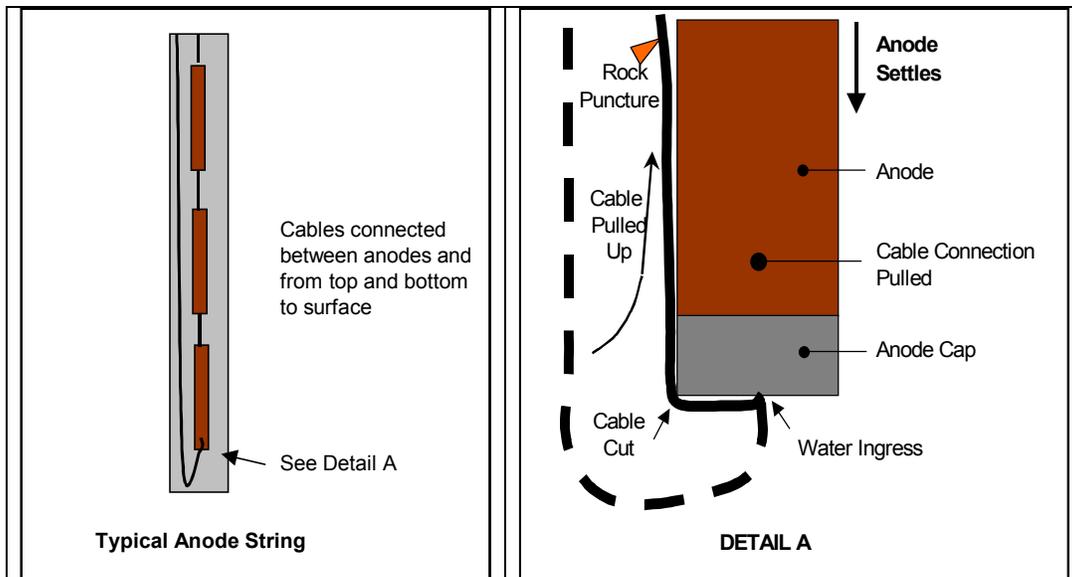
Typical Anode String in Early Installations Showing Possible Cable Failures
